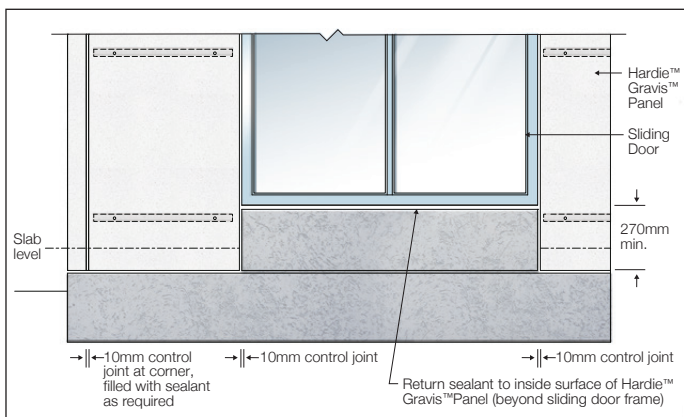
SLIDING DOOR FOR CONCRETE SILL DETAIL
